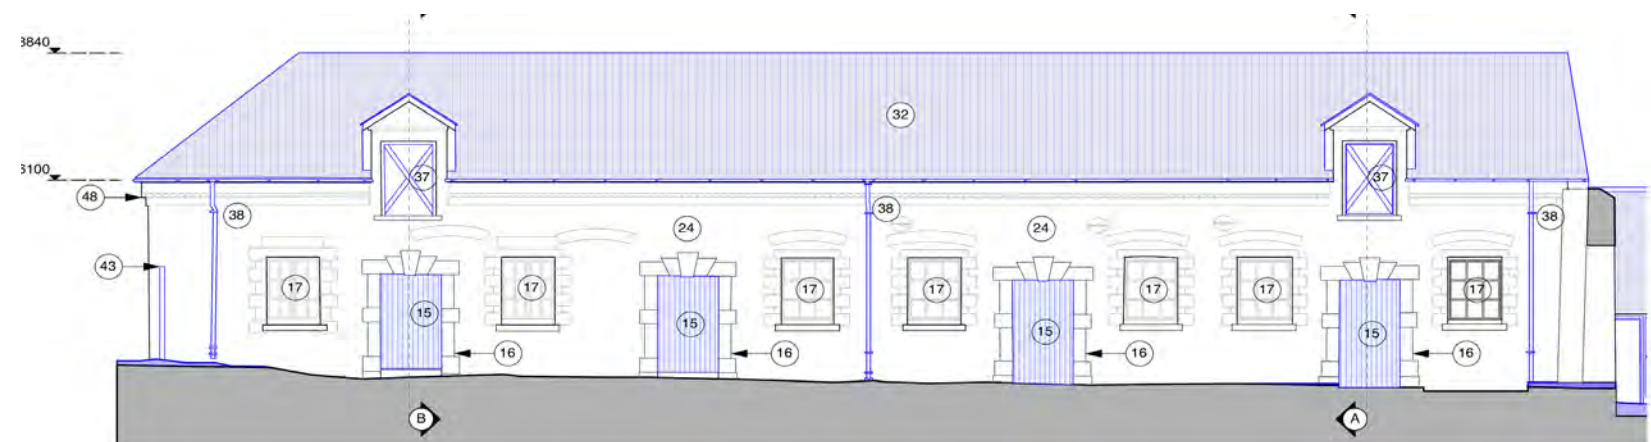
Building 2, east range existing drawings indicating areas of proposed works
